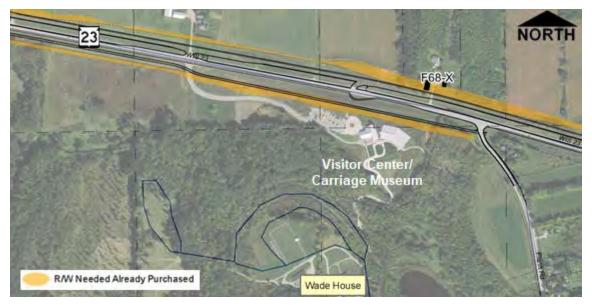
4-lane On-alignment Alternative at Wade House Historic Site
